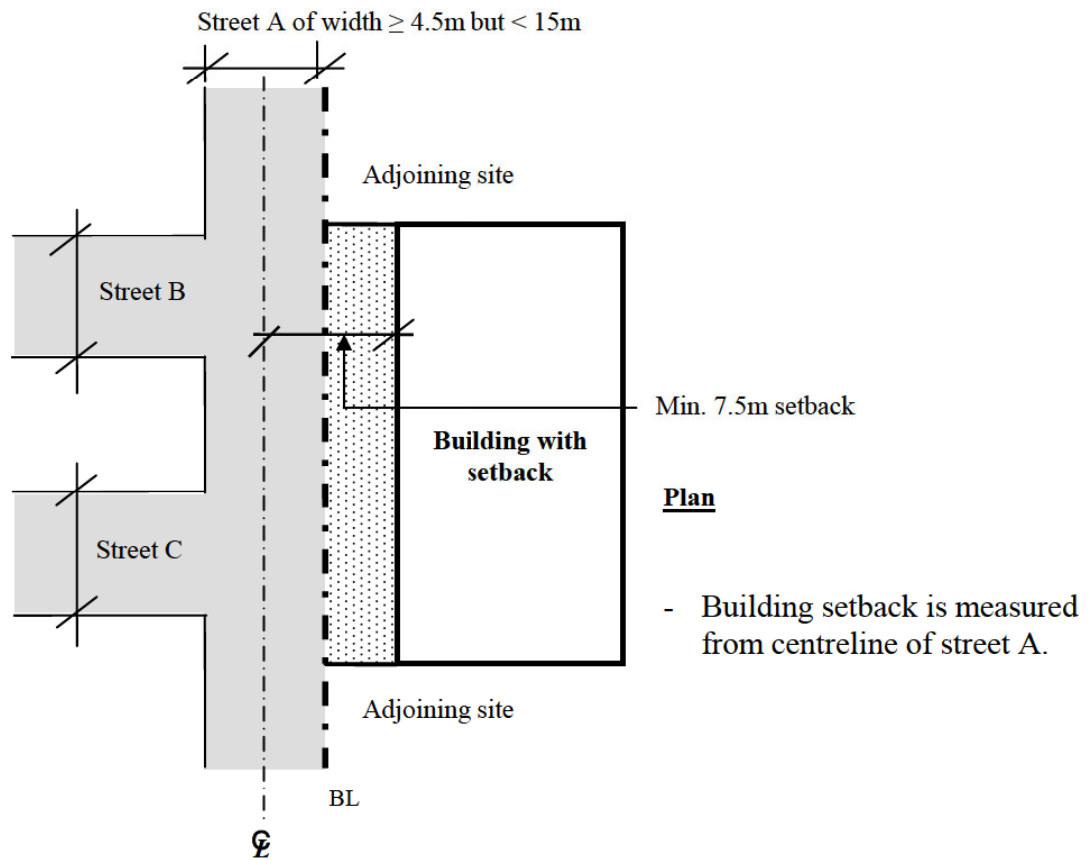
Example (3) of Building Setback - Site abutting streets at intersections
